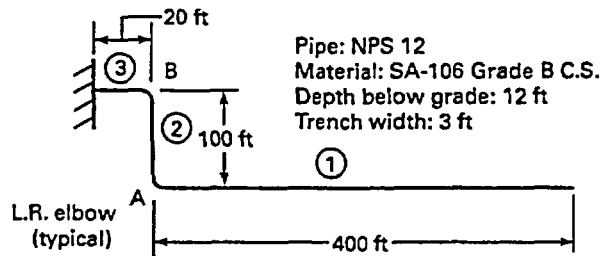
PLAN OF EXAMPLE BURIED PIPE
